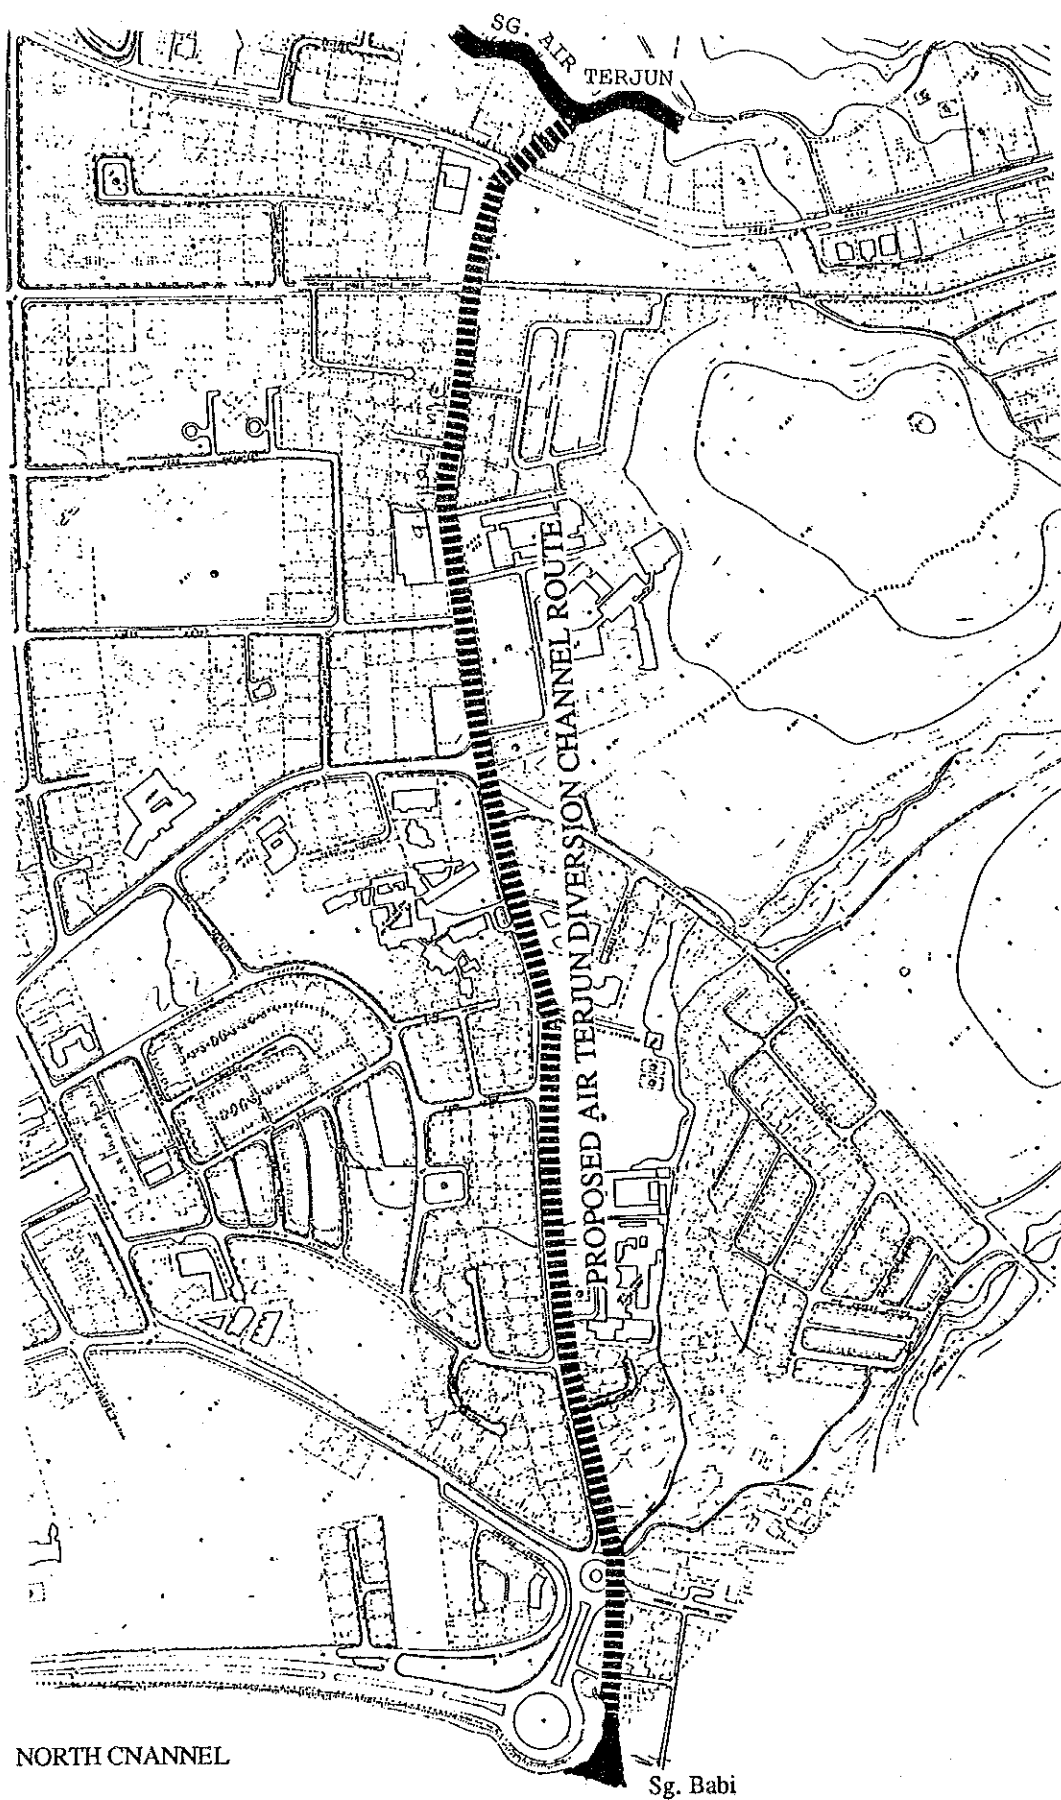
PLAN OF PROPOSED AIR TERJUN DIVERSION CHANNEL ROUTE
